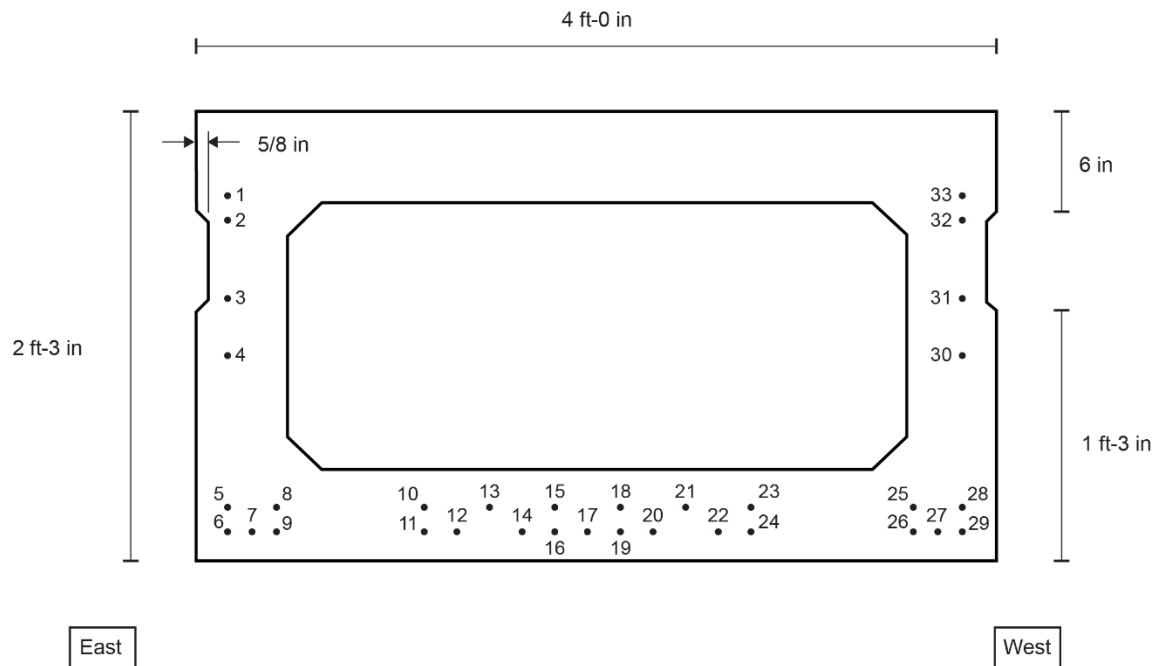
Grid Marked on Aden Road Bridge Box Beams for Half Cell Potential Testing.
